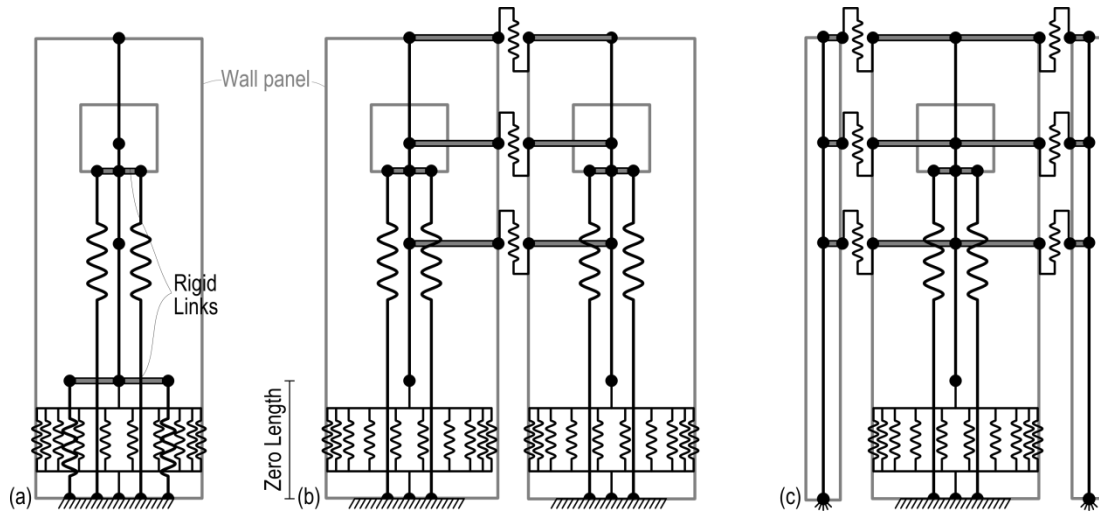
Multi-spring models overview. (a) Single wall; (b) coupled walls; (c) column-wall-column system.
